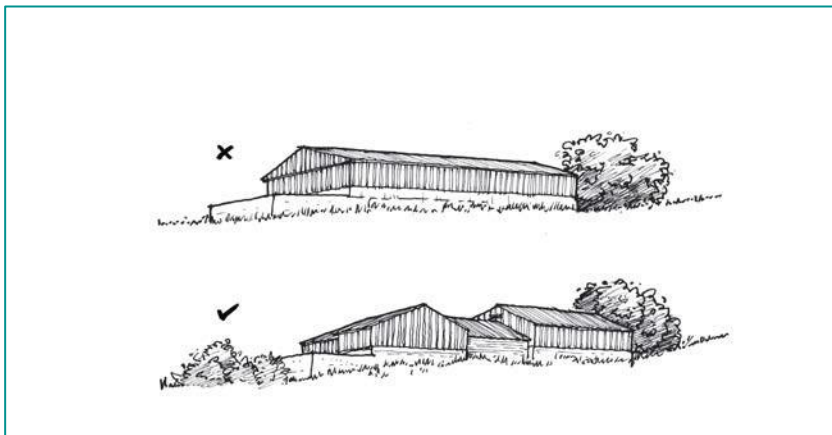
Good and poor examples buildings designed to reduce its impact on the landscape.
